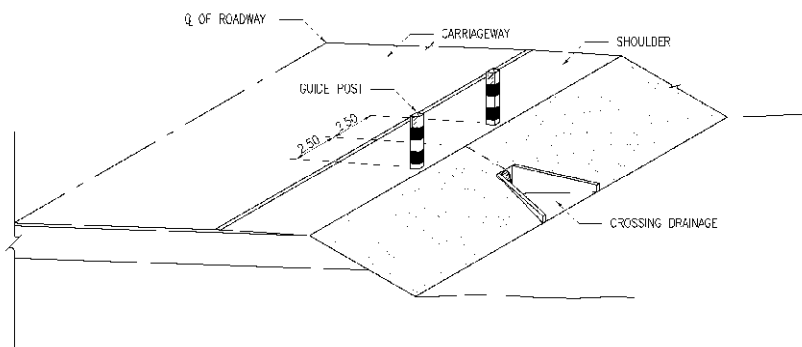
Guide Post Installation at Drainage Crossing
